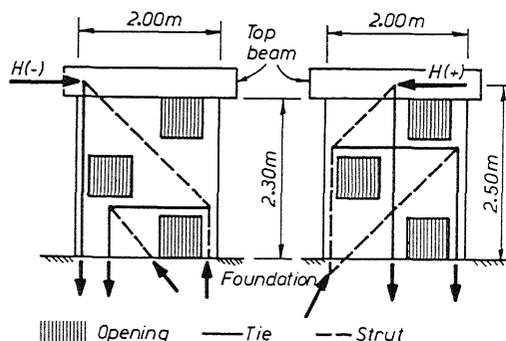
Model wall with irregular openings showing possible strut and tie models for lateral loading acting from the left and from the right.
